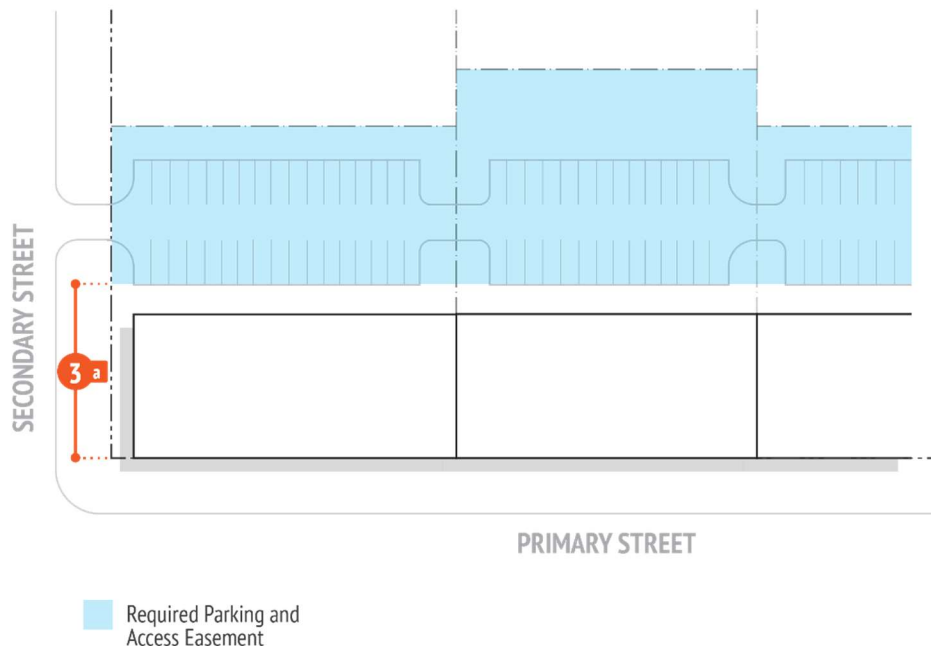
DE and DW Subdistricts Parking and Access Easement
